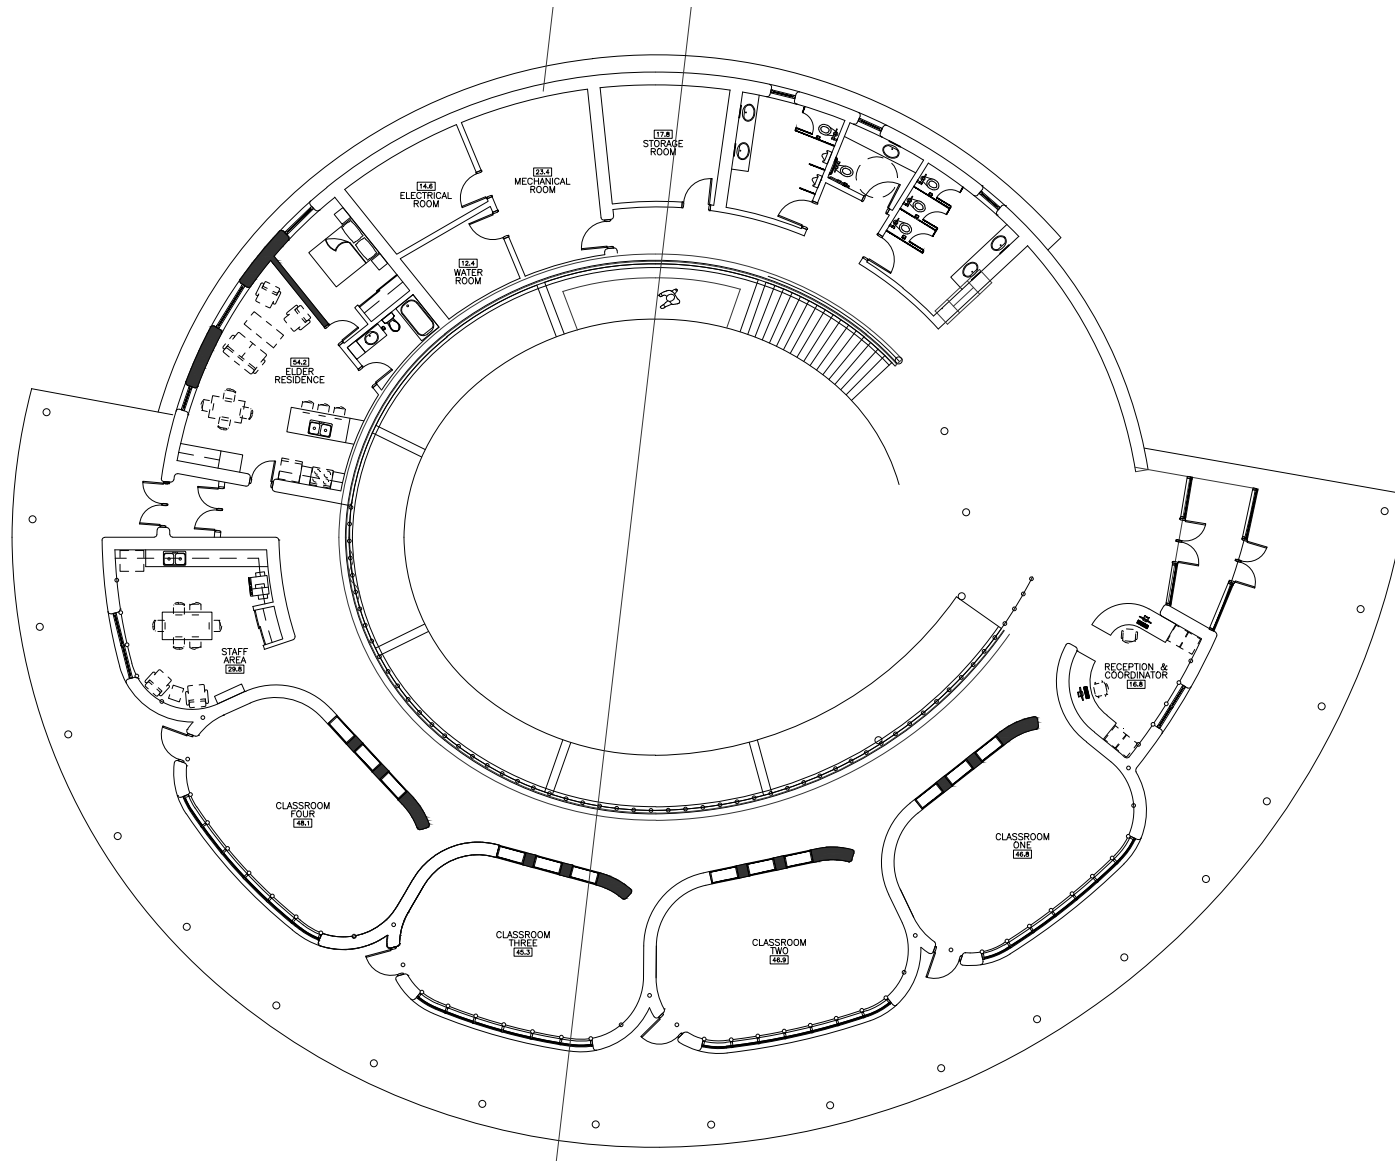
Fourth iteration: Ground plan showing much more detail and scale
